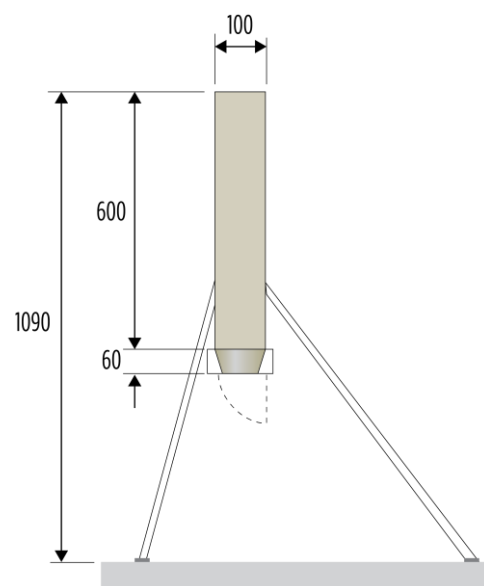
Orimet Testing Apparatus [5] (all dimensions are in millimetres)
